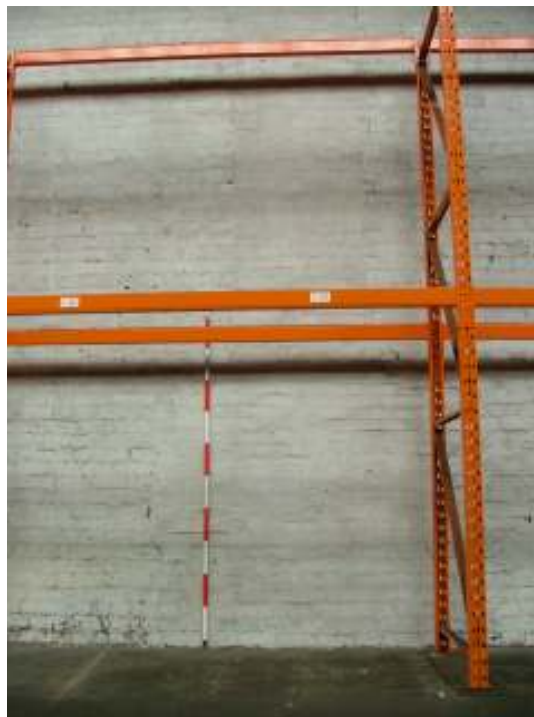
North-eastern wall of engine shed, showing 1 of the 4 possible former fireplaces along the wall (Scale = 2m)
